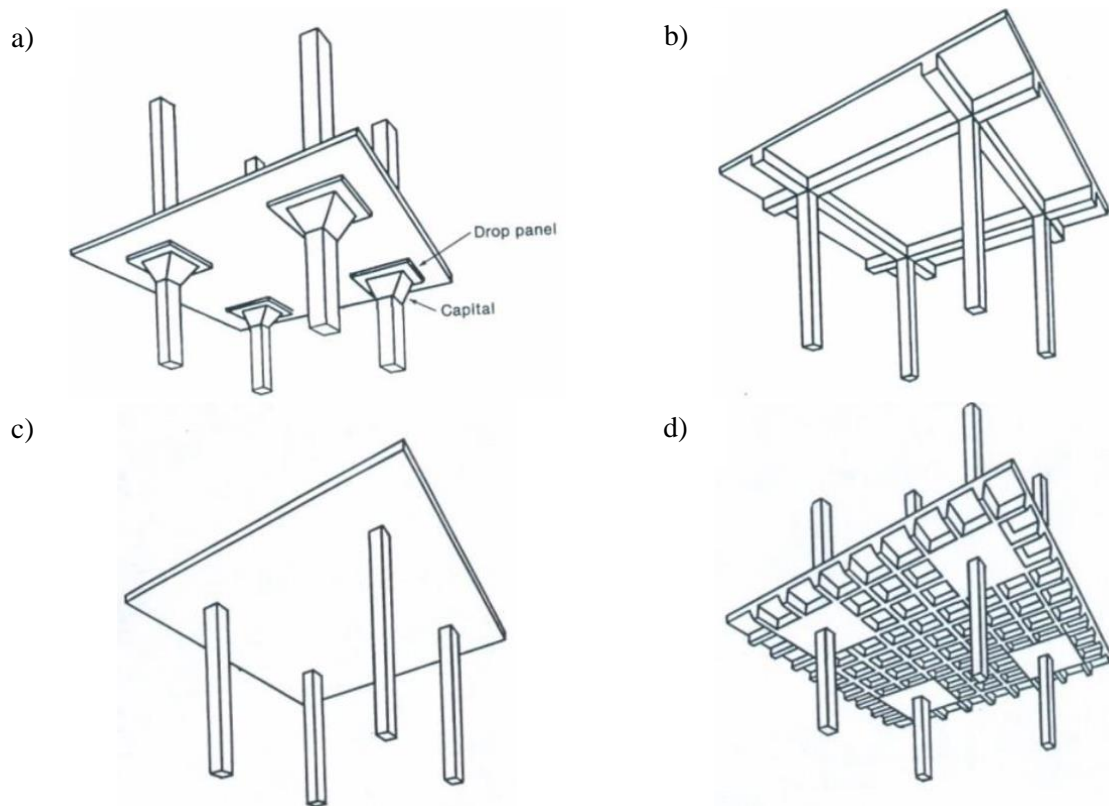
Typical Flat Slab Systems, a) Flat Slab with Column Capitals and Drop Panels, b) Two-way slab on beams and girders, c) Flat Slab, d) Waffle Slab, Acknowledgement: Reinforced Concrete Mechanics and Design, MacGregor and Bartlett (2000), ©2000 Pearson Education Canada Inc.
